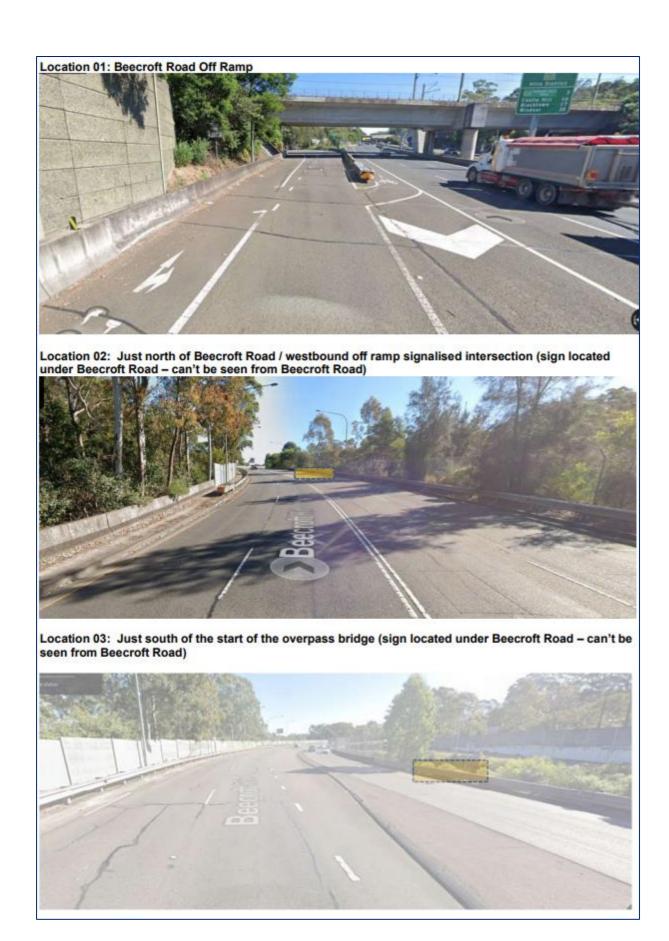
| Views of the sign from Beecroft Road detailing why an anti-gawk screen is unnecessary (Source: Applicant's RTS)
